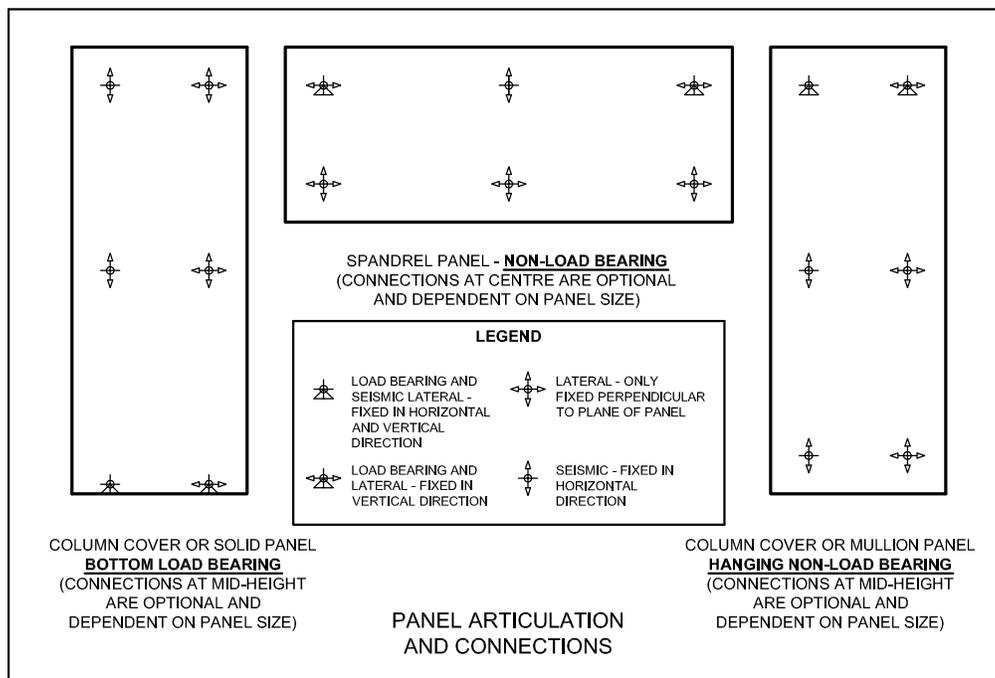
Panel Articulation. Source: M. E. Hachborn Engineering
